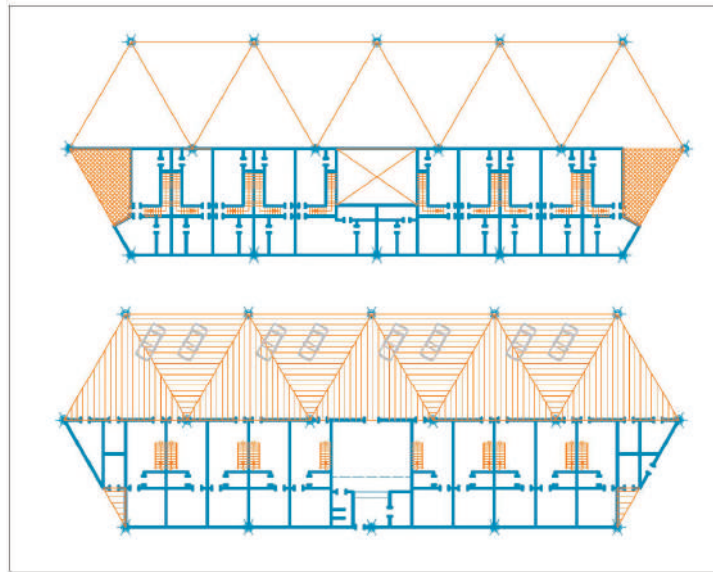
Planning solutions: the Highly comfortable motel (10 apartments) with parking under a canopy—1st, 2nd floors.
